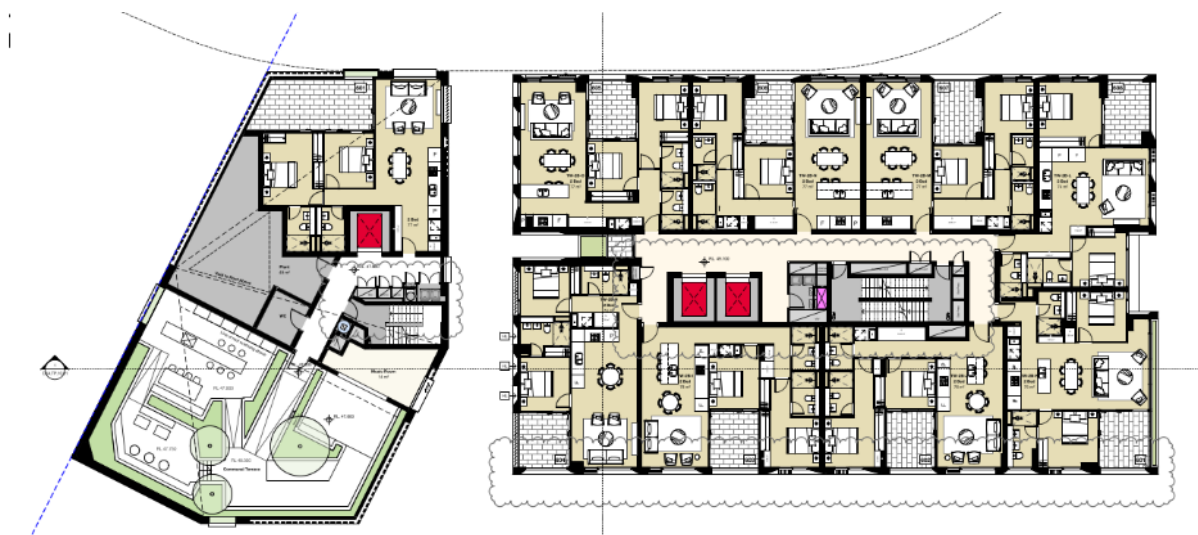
Level 6: Plaza and Tower Buildings, including communal private open space (Plaza Building)
